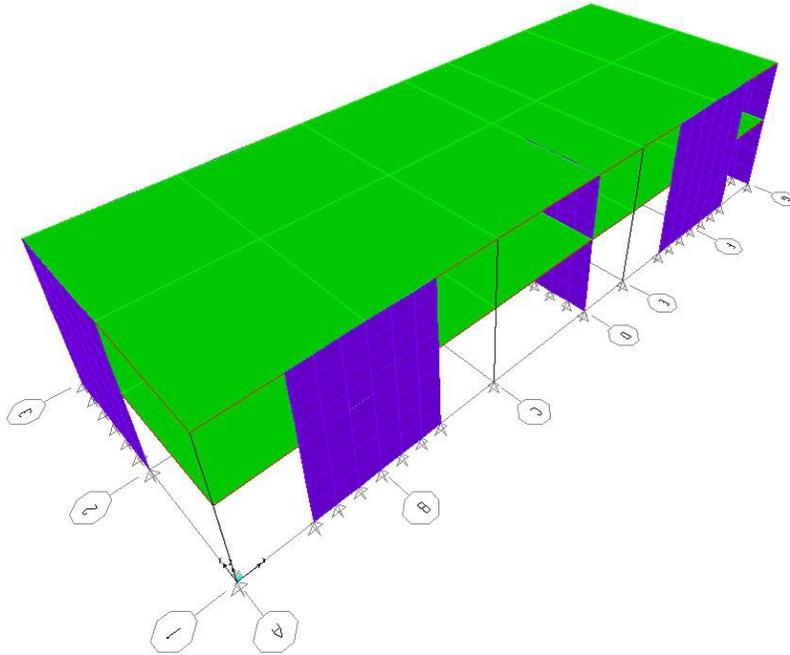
A 3-D numerical model of a retrofitted building with RC shear walls (RS3).
